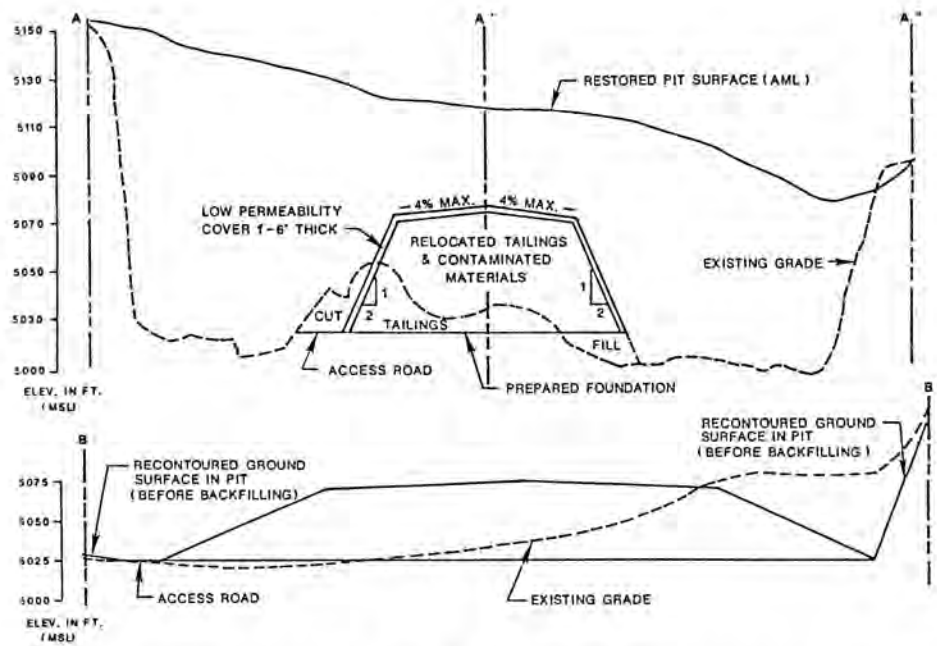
Typical Cross Sections A-A' and B-B' of the Proposed Embankment in the Spook Pit Converse County,
